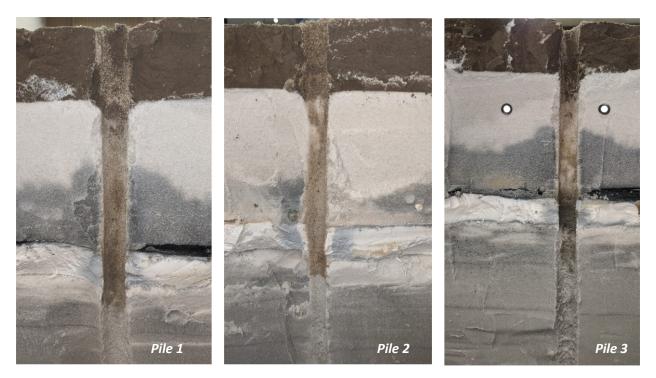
Cross-section view of soil around Pile 1, Pile 2, and Pile 3 during the excavation process.
